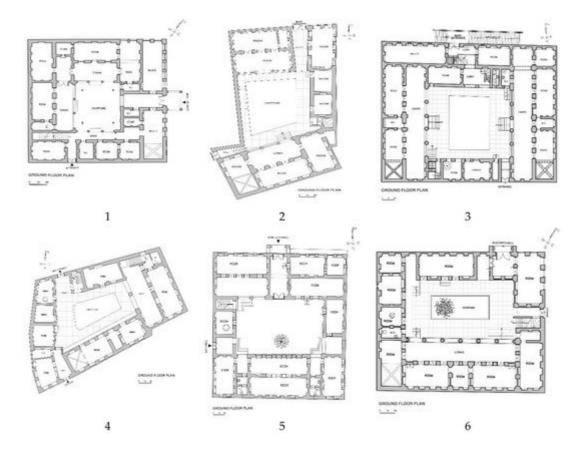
Plans of wind tower houses in Dubai, showing their locations (indicated with cross section). (1)-House of Abdul-Rahman Farouq. (2)-House of Mir Abdel Wahid MIRI. (3)-House of Mohammed Sherif Al-Olama. (4)-House of Mohammed Saleh Fikree. (5)-House of Abdul-Razzaq Al-Bastaki. (6)-House of Abdulla Mohammed Al-Bastaki.
